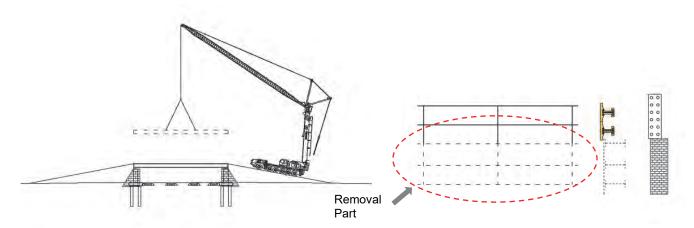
Reconstruction Procedure of Step 4 for Type-2 Bridge
